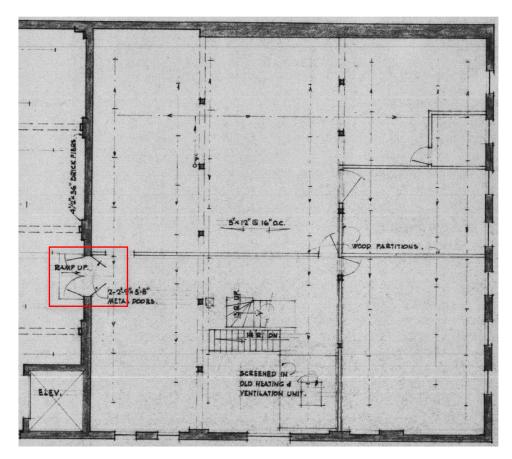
Detail of a 1977 plan, showing the existing doorway between the front and rear portions of the building. 75 Note that north is to the bottom.
